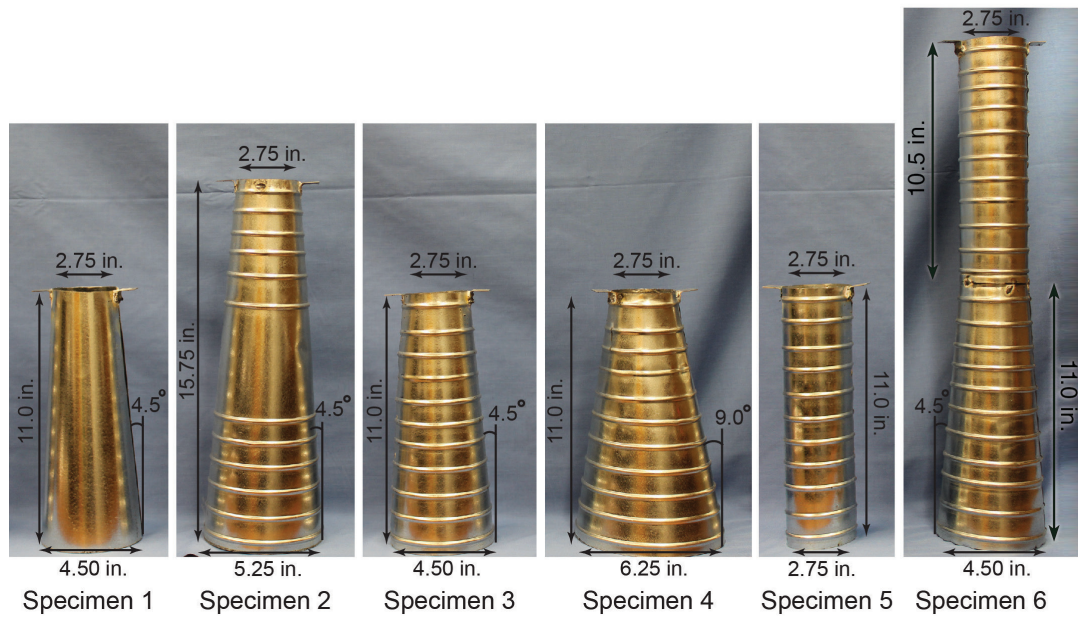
Connector sleeve dimensions. Note: 1 in. = 25.4 mm.
